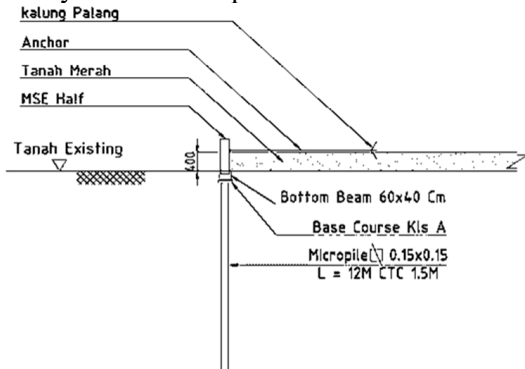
Installation of Anchors, Cross Necklaces, and Startails within the MSE Half panel system
